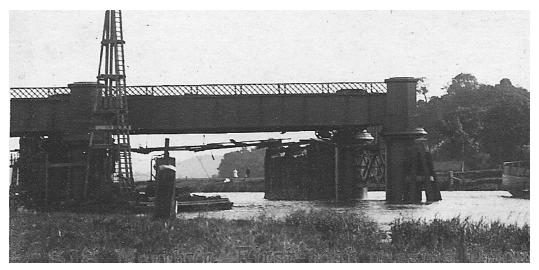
Detail of demolition of Brunel's bridge (private collection)
